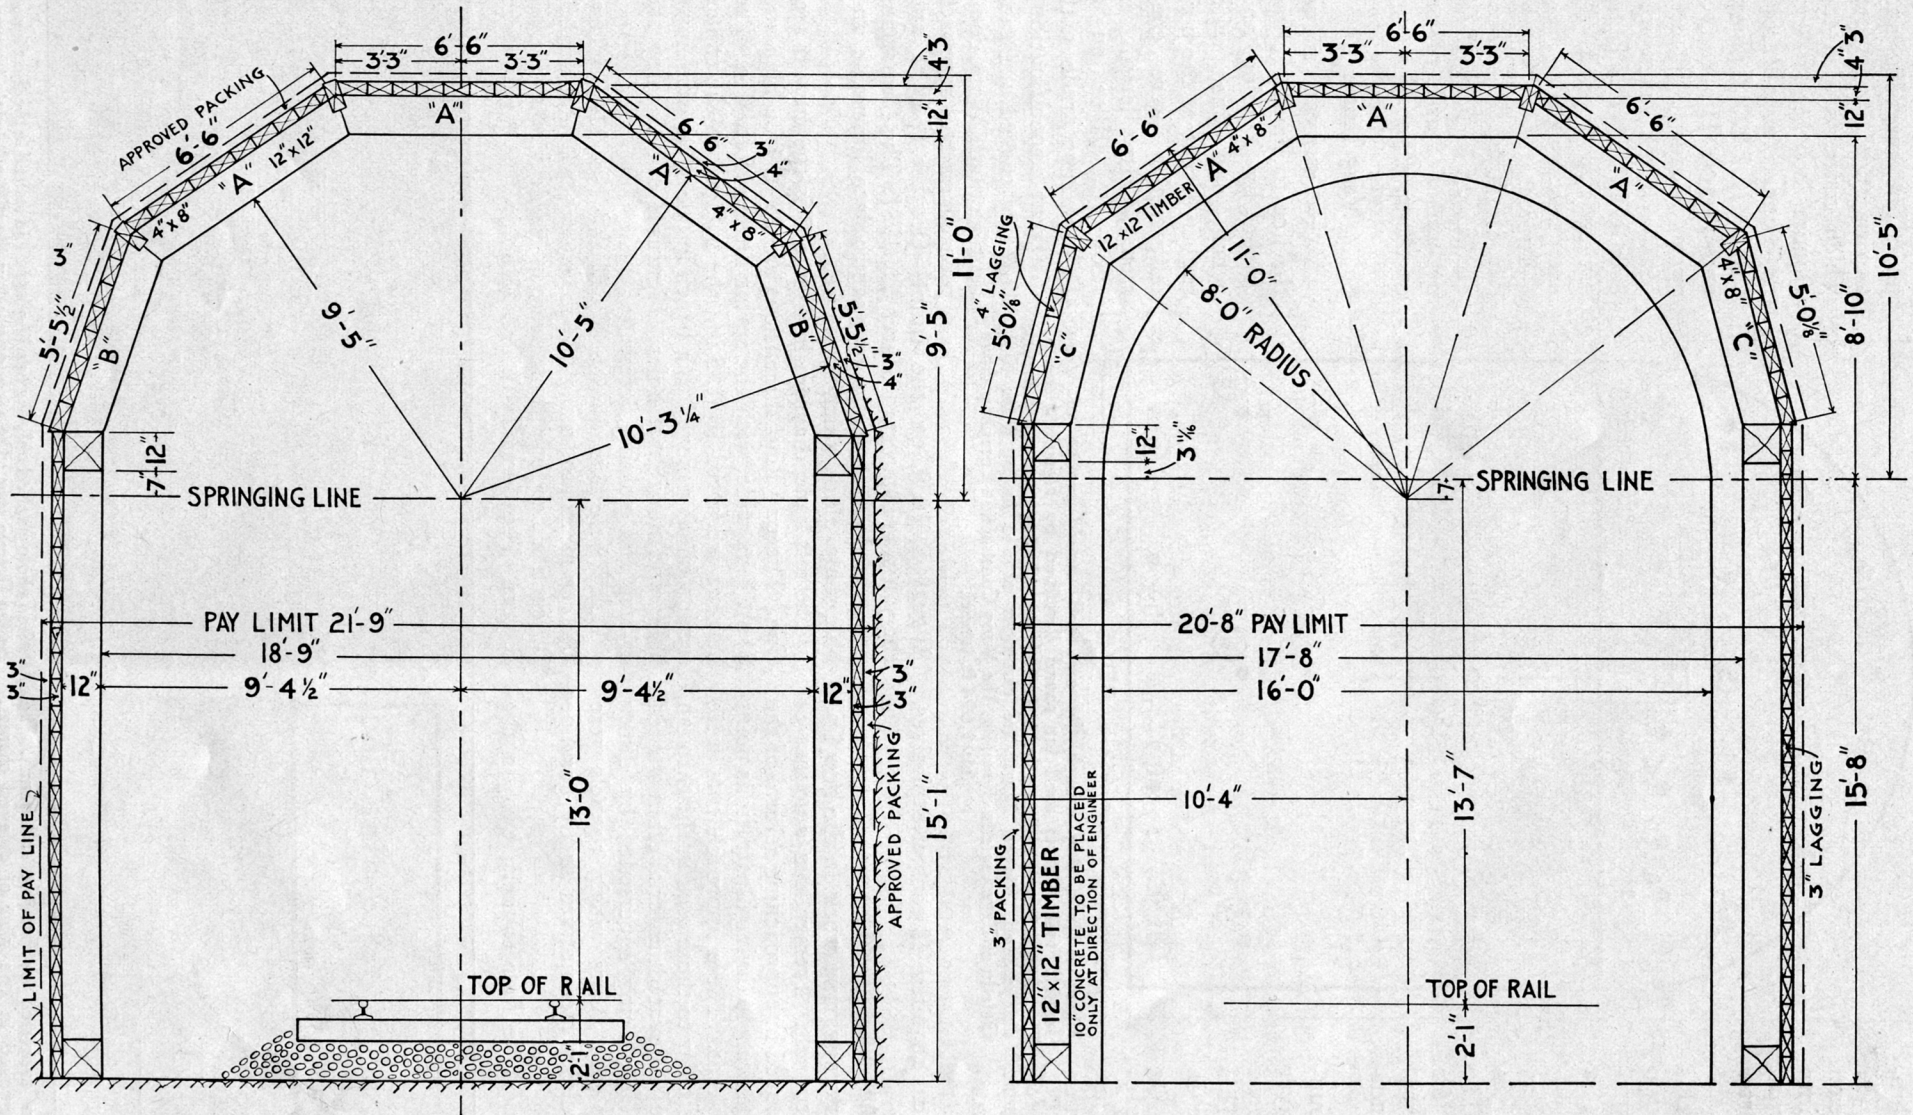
The Donora Southern connection tunnels required two sets of specifications—for curve (left) sections and for tangent (right) sections. These tunnels generally were not concrete-lined, instead the approved dry packing behind lagging was employed. Where directed, however, 10 inches of concrete was placed. Caps were of 12-in by 12-in. timber. "A" was 6 ft. 6 in. long at the top, and 5 ft. 10½ in. at the bottom, with bottom ends tapered 3¾ in. "B" timber was 5 ft. 5¼ in. at top, 4 ft. 9¼ in. at bottom, with ends cut 4¼ in. and 3¾ in. "C" timber measured 4 ft. 11¾ in. at top, 4 ft. 3¾ in. at bottom, with tapers of 3 in. and 5 in. at the bottom. Figures 4, 5, and 6 describe drilling and blasting methods used in shooting these Donora tunnels.
